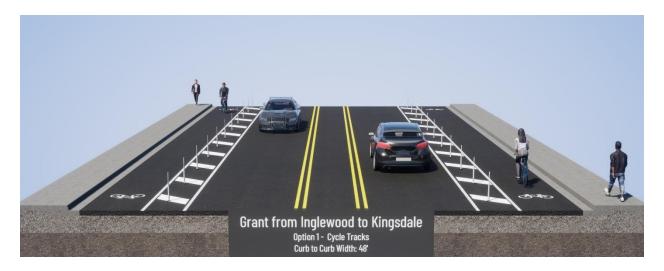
Proposed Section of Recommended Facilities for Grant Avenue, from Inglewood Avenue to Kingsdale Avenue
